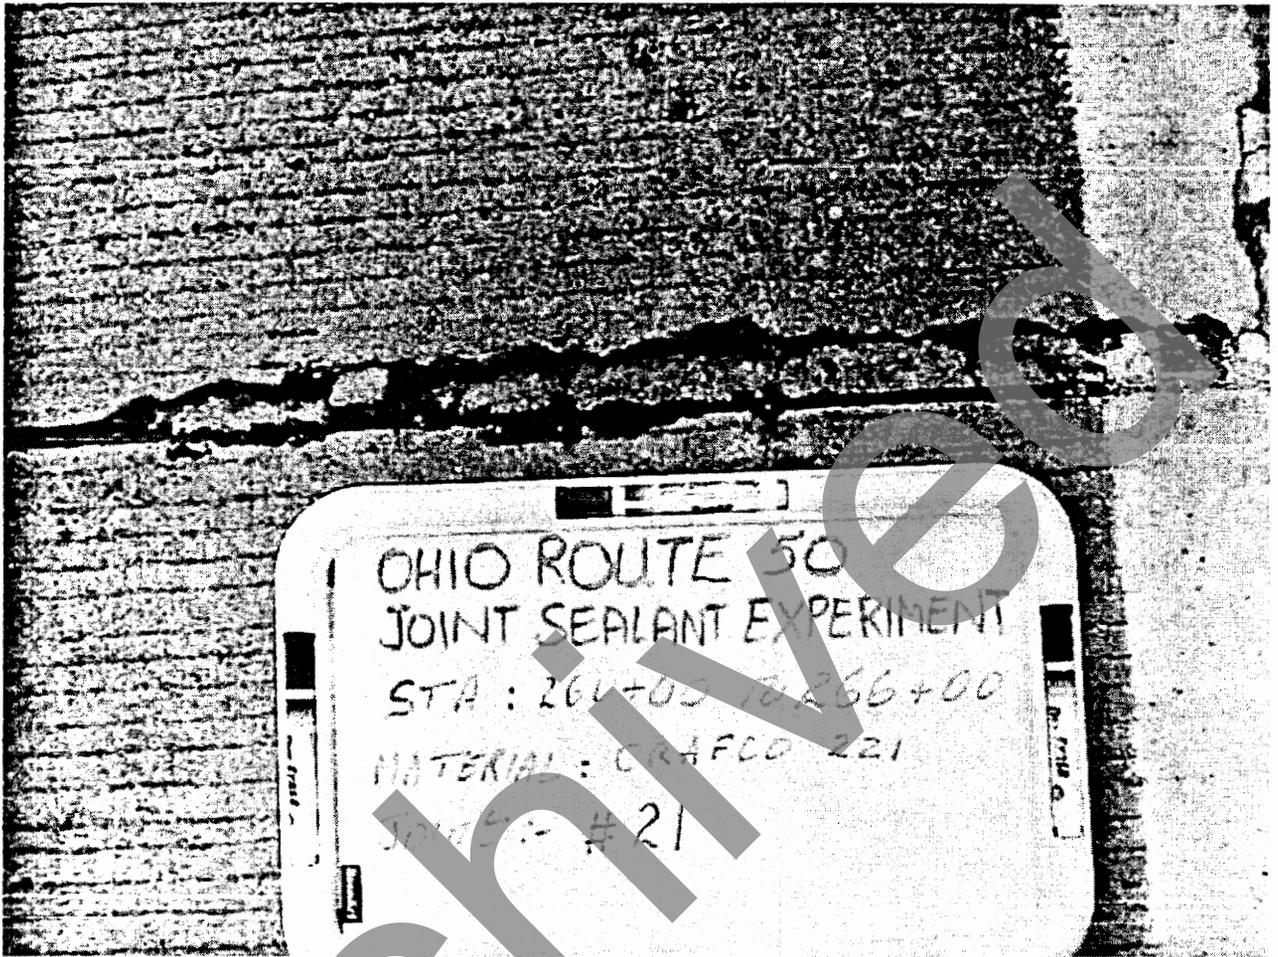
Severe cracking and spalling in Joint 21 of the eastbound Crafcoc 221 (1) section
